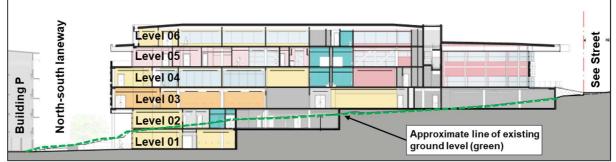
| East-west section through the Hub Building (Base source: Applicant's SRtS 2020)
